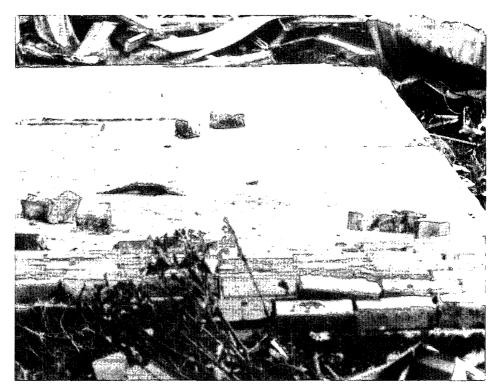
The roof on this house was not anchored very well and was uplifted and displaced during peripherial winds in the Mesquite, Texas tornado on December 13, 1984. Wind velocities less than 100 m.p.h. can cause such residential damage.
